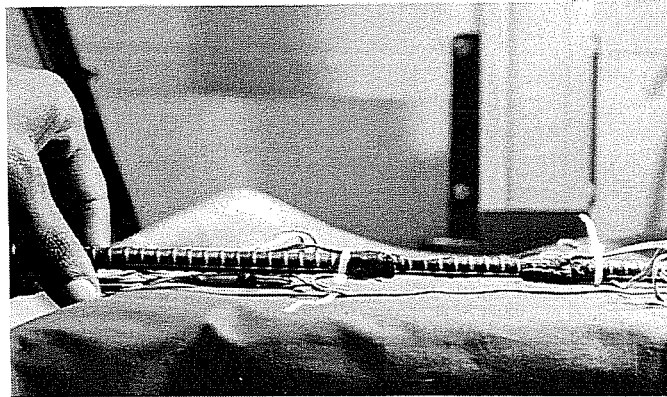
Reduction in Rebar Cross Section Due to Strain Gage Placement
